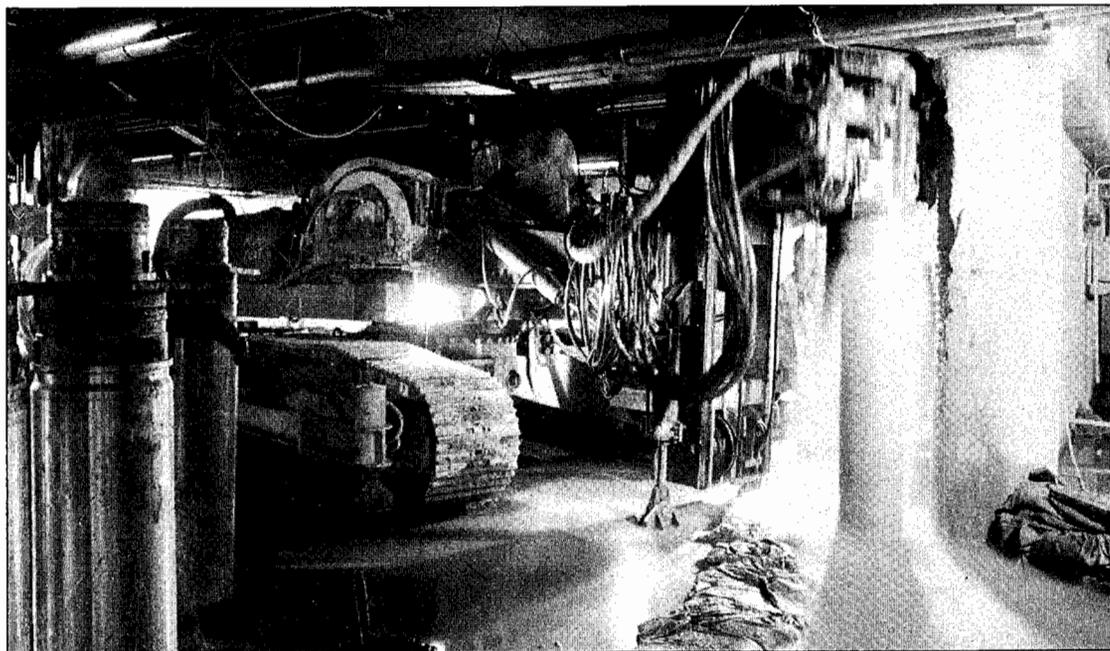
A view of the Bauer BG-7 drill rig drilling in limited headroom space with short mast.
